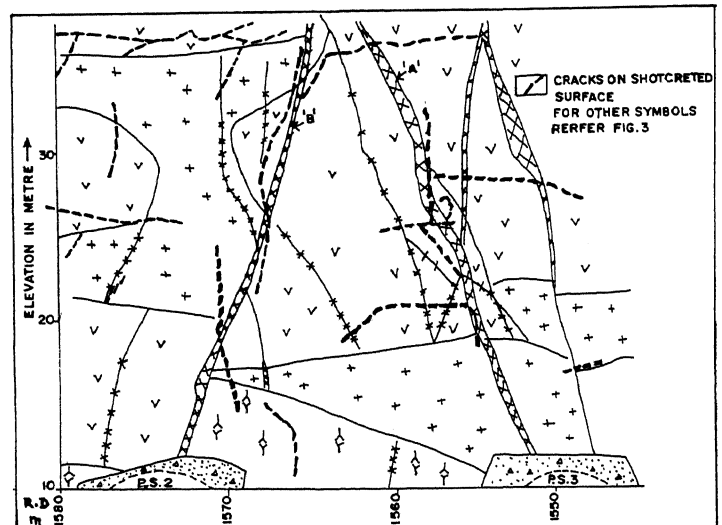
PART OF UPSTREAM FACE OF THE MACHINE HALL SHOWING DISPOSITION OF CRACKS.
